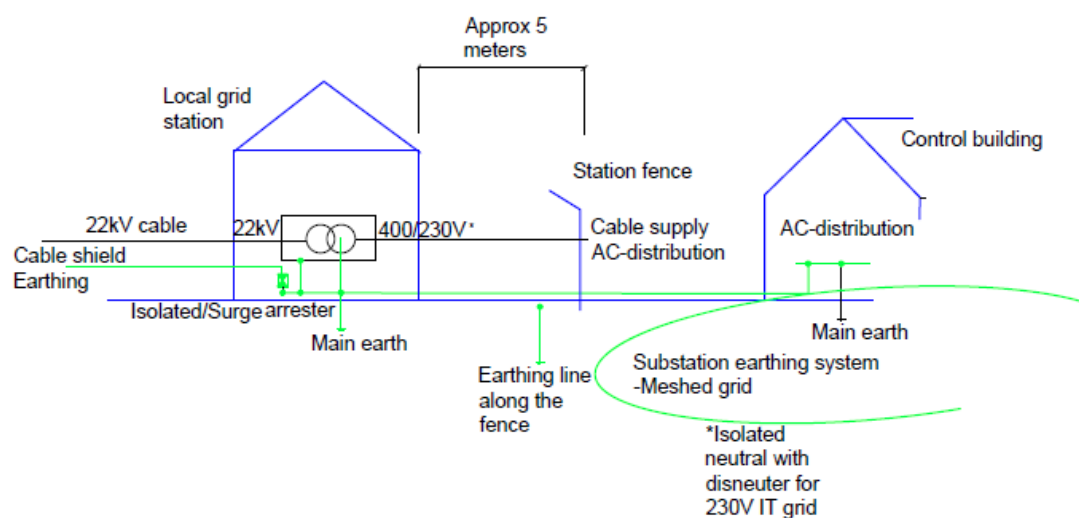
Example of 22 kV cable shielding insulated from the substation's earthing via an arrester
